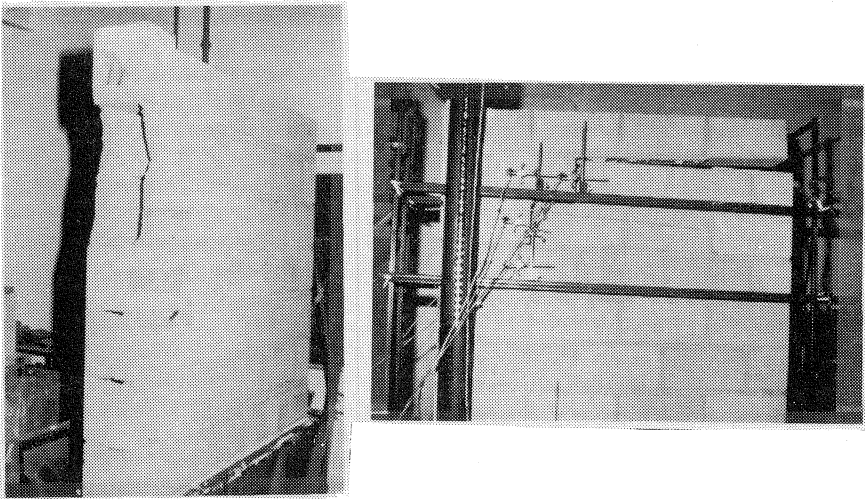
Failure of a face-shell bedded masonry wallette with a load on the end. The bond-beam rises as the end spalls off.
